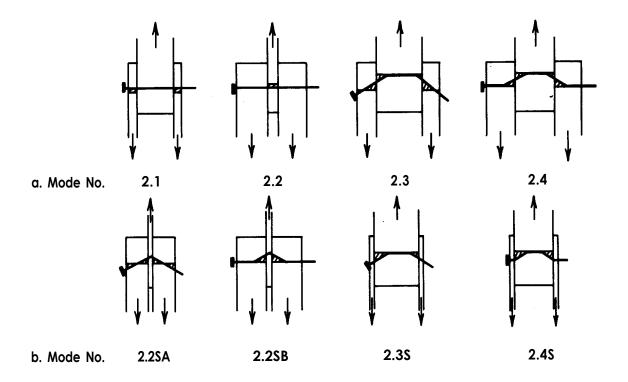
Failure modes for three-member joints (a) with all wood members and (b) with steel side or main members. (ML85 5340)
